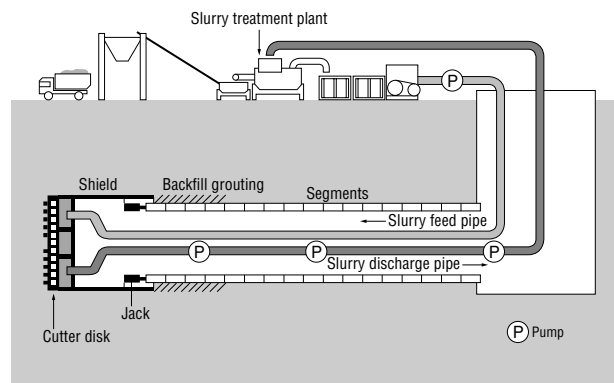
Tunnel Construction using Shield Tunneling Machine (Pressurized Slurry Shield Type)
